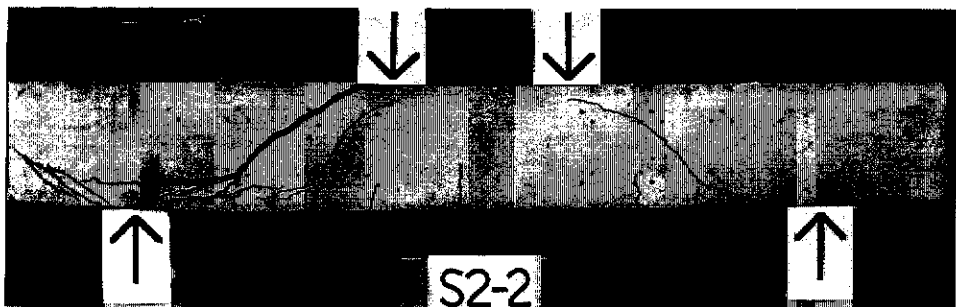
Crack Pattern of the Front Face of Beam S2-2
